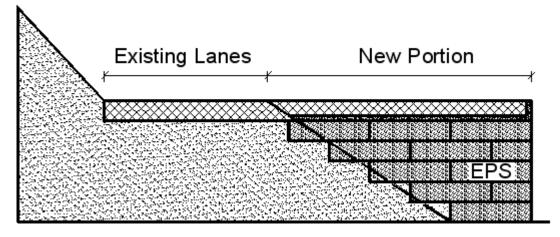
Widening Embankments Utilizing EPS Geofoam
